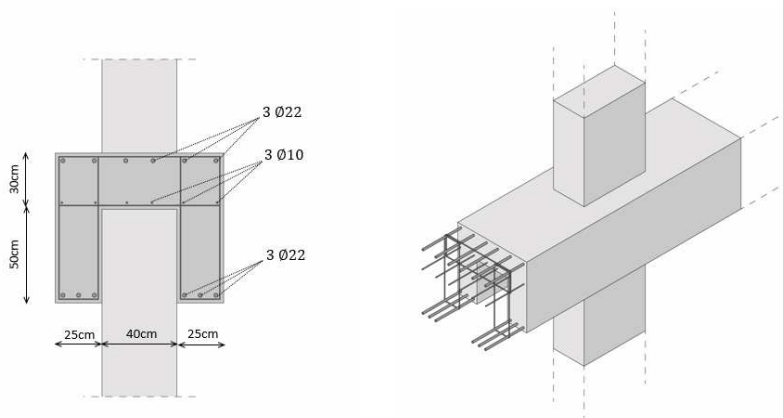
Column-transversal beam joint: beam cross-section (left) and 3D view (right)
